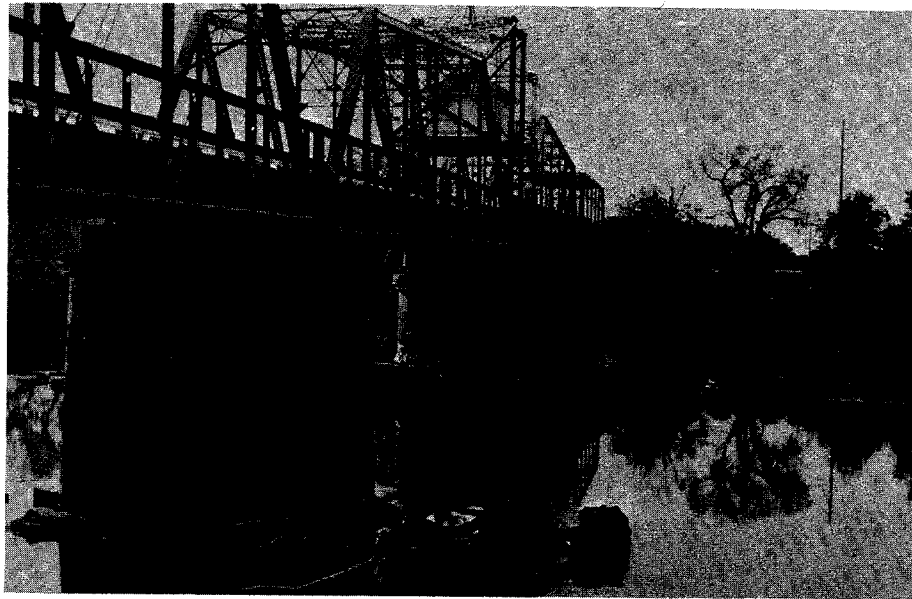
View of center pier with concrete fender debris deflector, in November 1976.
